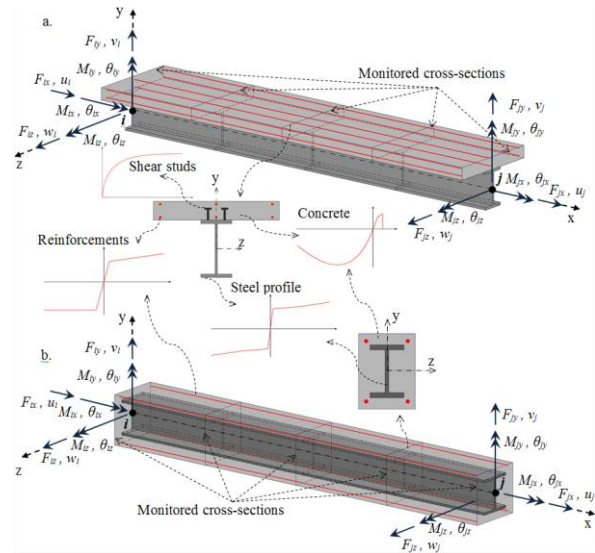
Beam-column element with 12 DOF (a) beam element; (b) column element.
